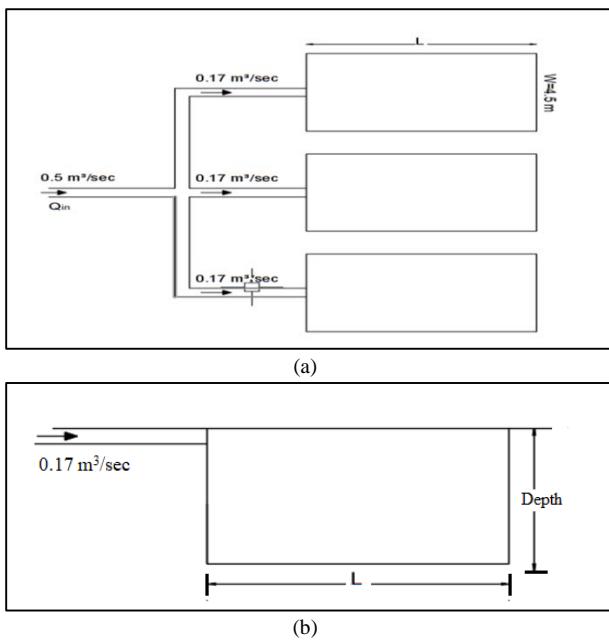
Details of aerated lagoon (a) Plan and (b) Section
